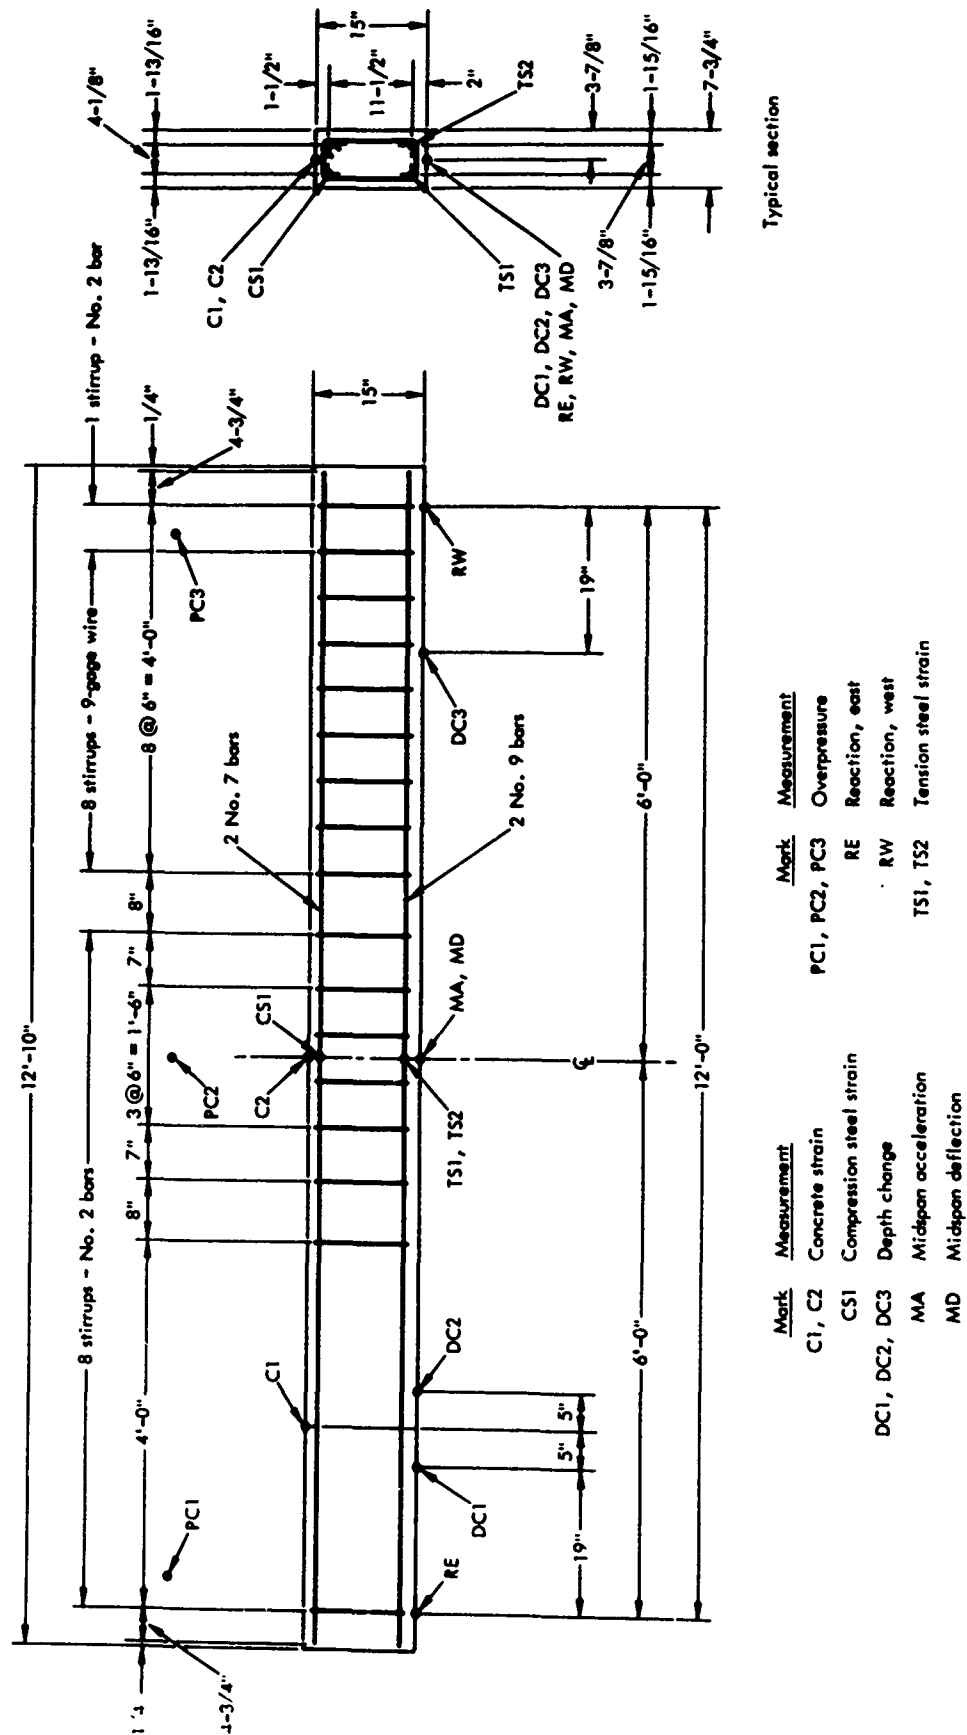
Details and instrumentation, beam Type III - without stirrups in the critical region.
